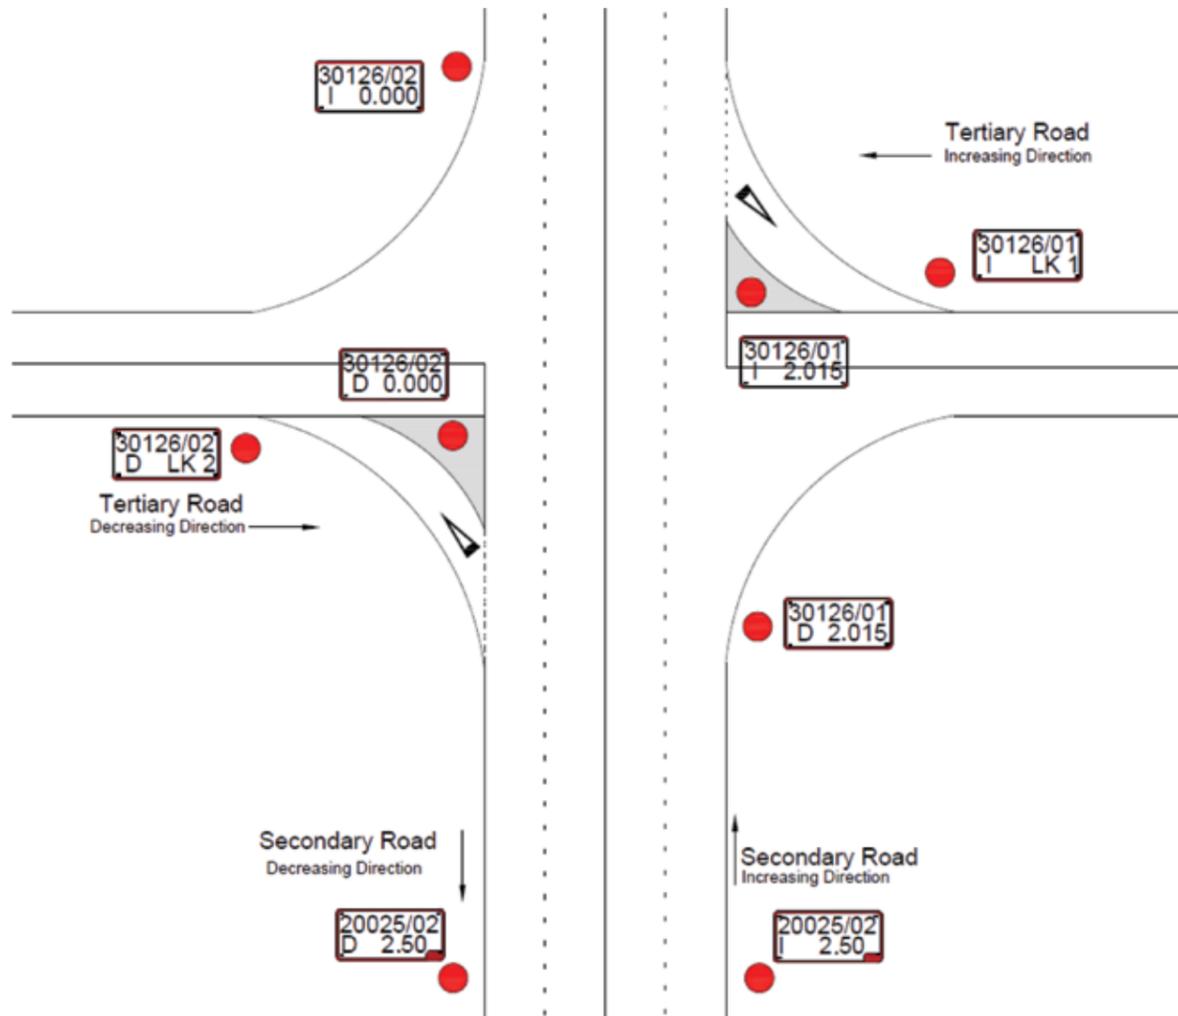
Typical NRS Sign Layout at a Signalised Intersection
